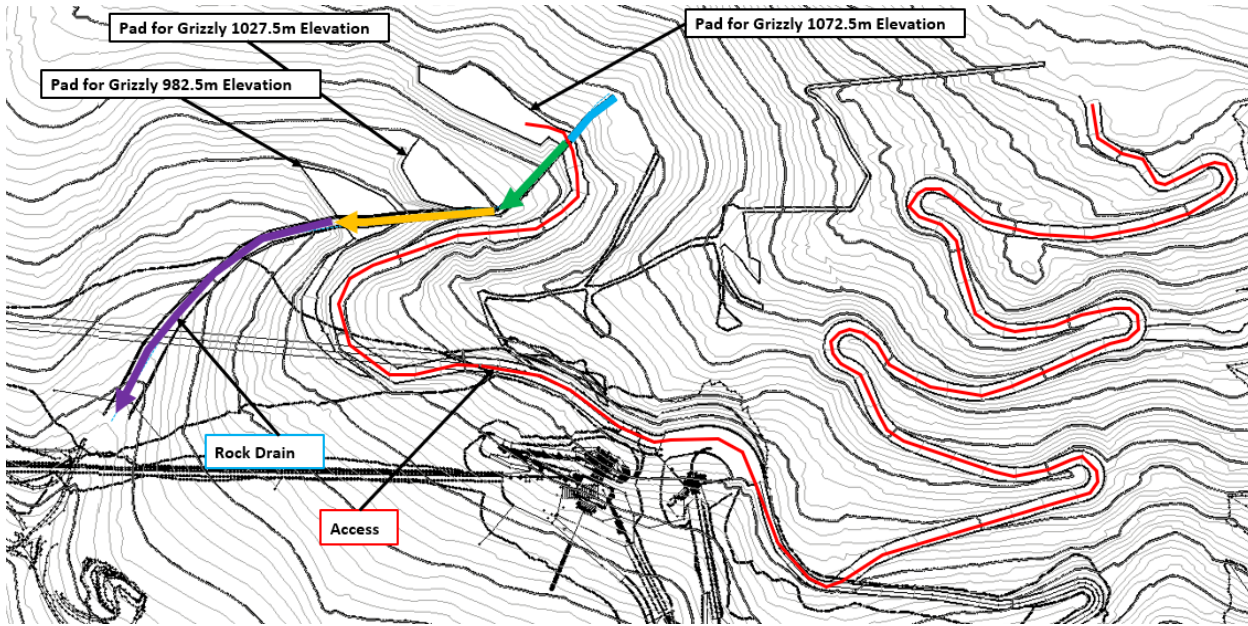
Eagle Pup WRSA Rock Drain Construction Phase 3 - 1,072.5 masl Elevation
